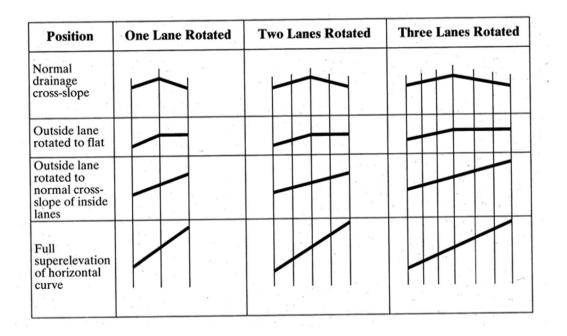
Achieving Superelevation by Rotation Around Center Line
